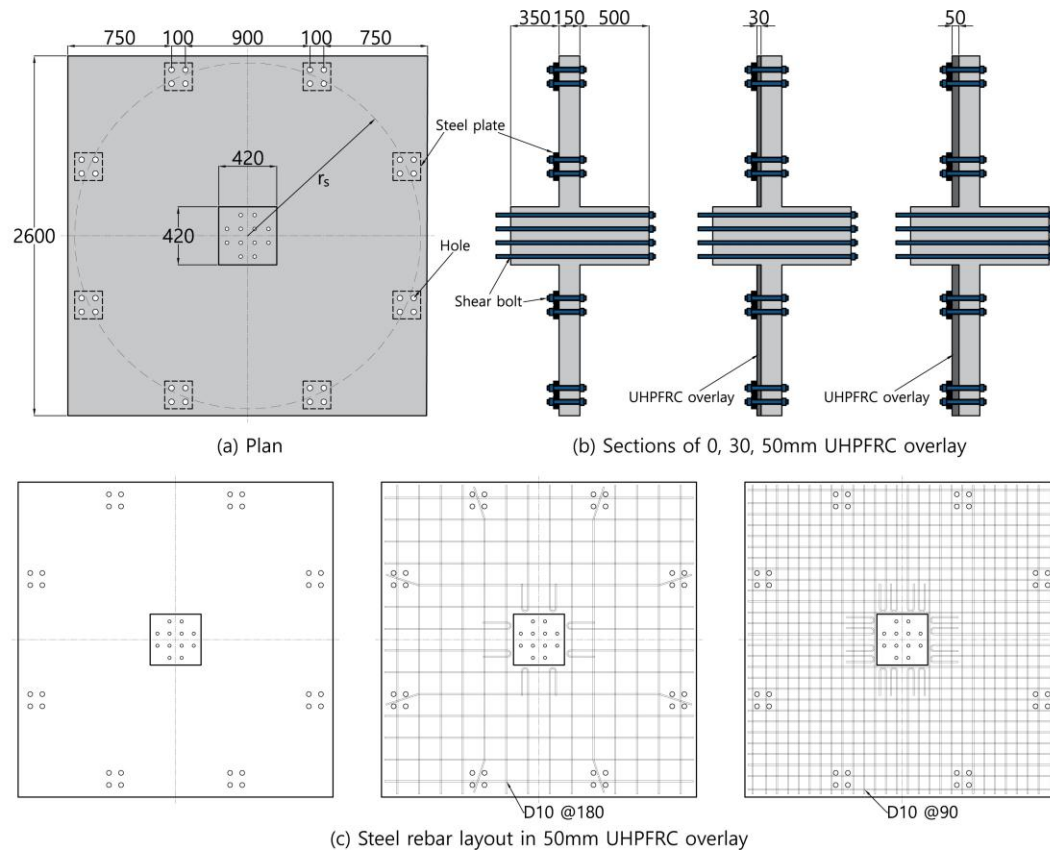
Plan and sections of specimens with 0, 30, 50mm UHPFRC overlay, and steel rebar layout in 50mm UHPFRC overlay
